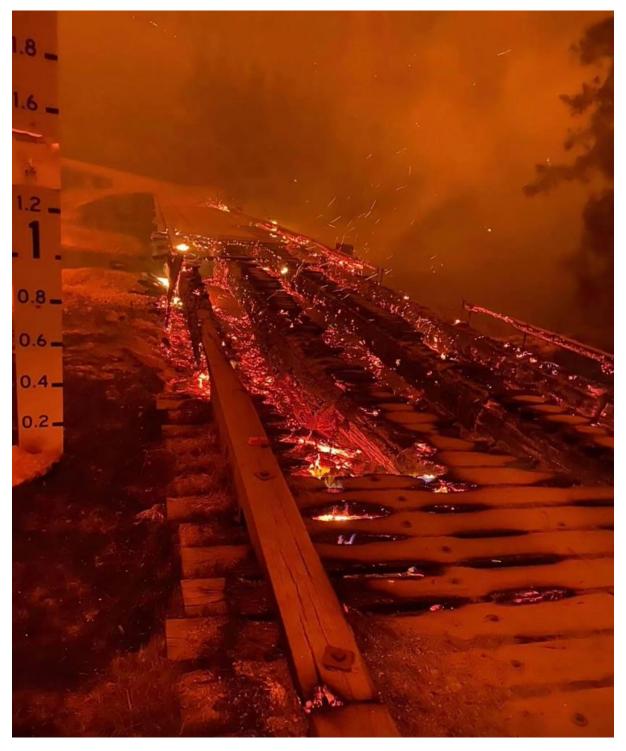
Murphys bridge 31 December 2019 during the bushfires (photo courtesy of local residents).
